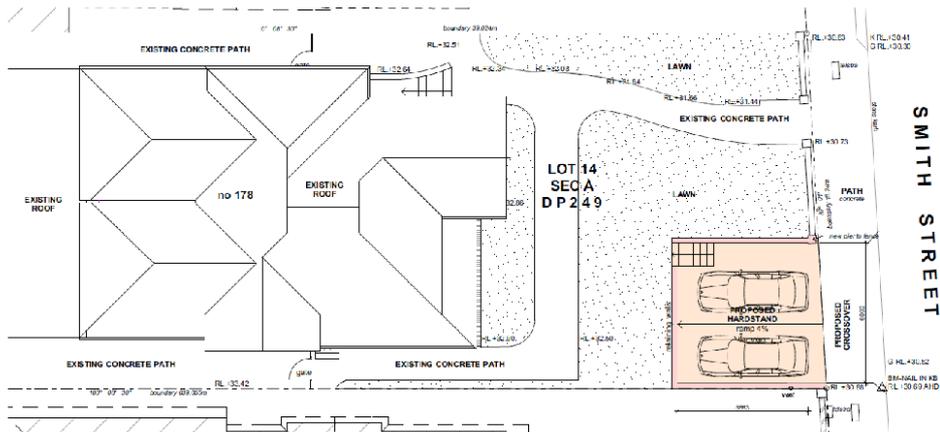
Proposed alterations for the fence and landscape of the heritage dwelling
